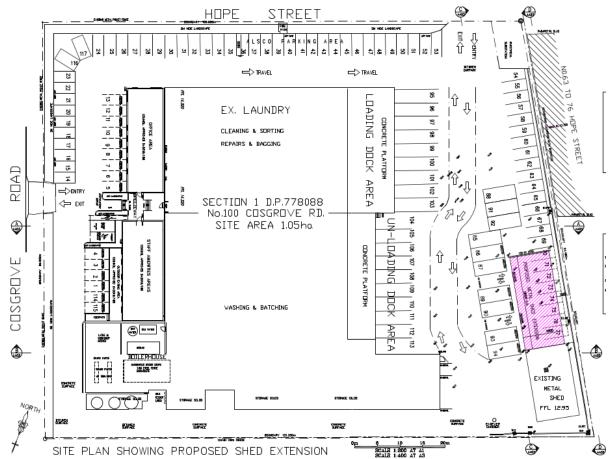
Extract of the site plan showing the proposed development highlighted (source: Majcon, dated 18/12/2020).
